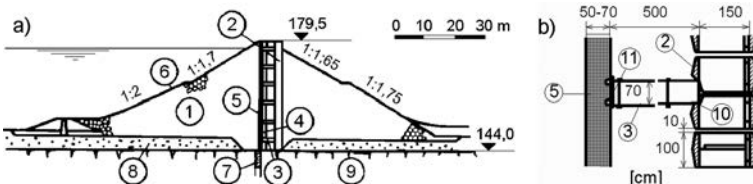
Dhünn dam (Germany). (1) Rockfill; (2) reinforced concrete inspection manhole (Swedish well); (3) pipes for instruments for observation of the asphaltic concrete core; (4) filter layer; (5) asphaltic concrete core; (6) stone lining; (7) concrete cutoff and grout curtain; (8) alluvial deposit; (9) bedrock; (10) benchmark for measuring the vertical deformations; (11) benchmark for measuring the horizontal deformations.
